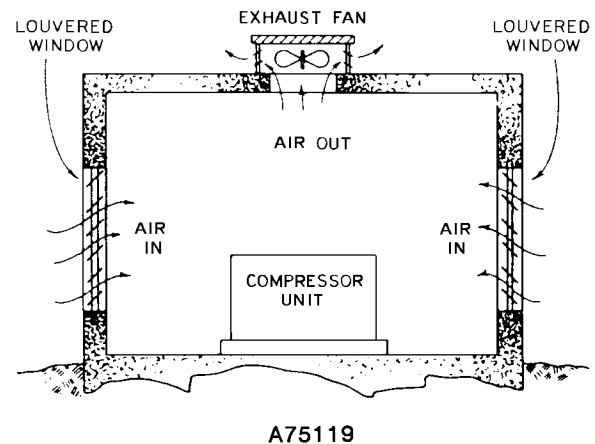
TYPICAL COMPRESSOR ROOM
